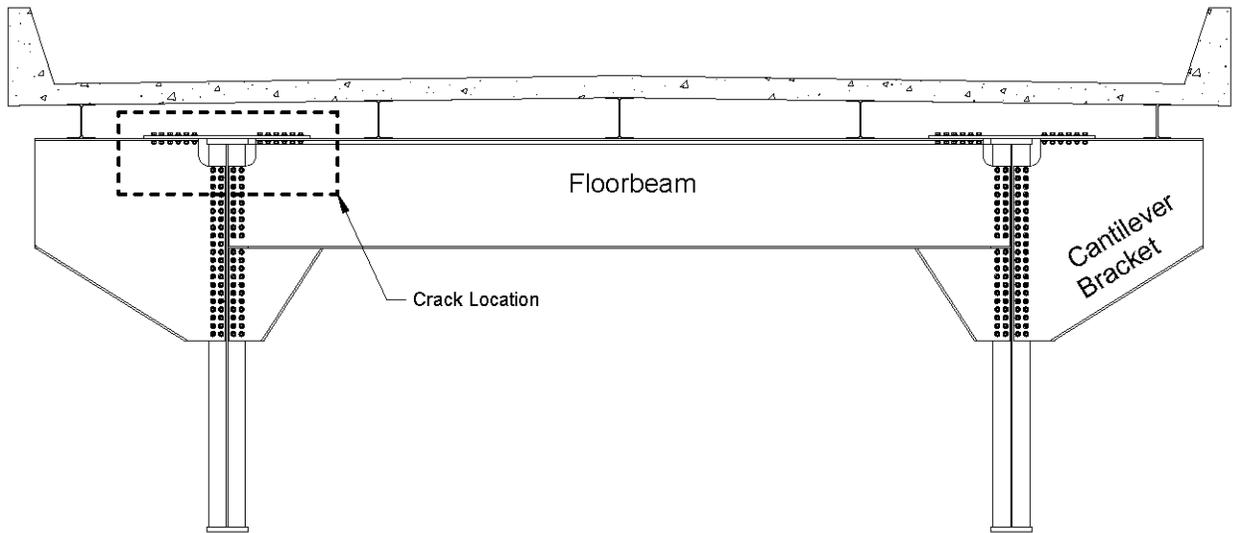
Typical cross-section of a two-girder bridge with cantilever bracket outriggers.
